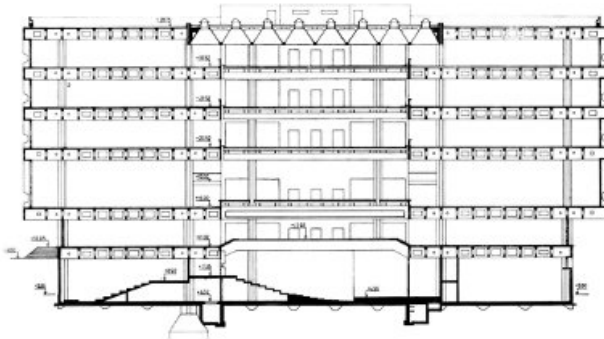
Section of the typical UBA block. Source: *Revista Construcciones* 219 (1969): 467.
